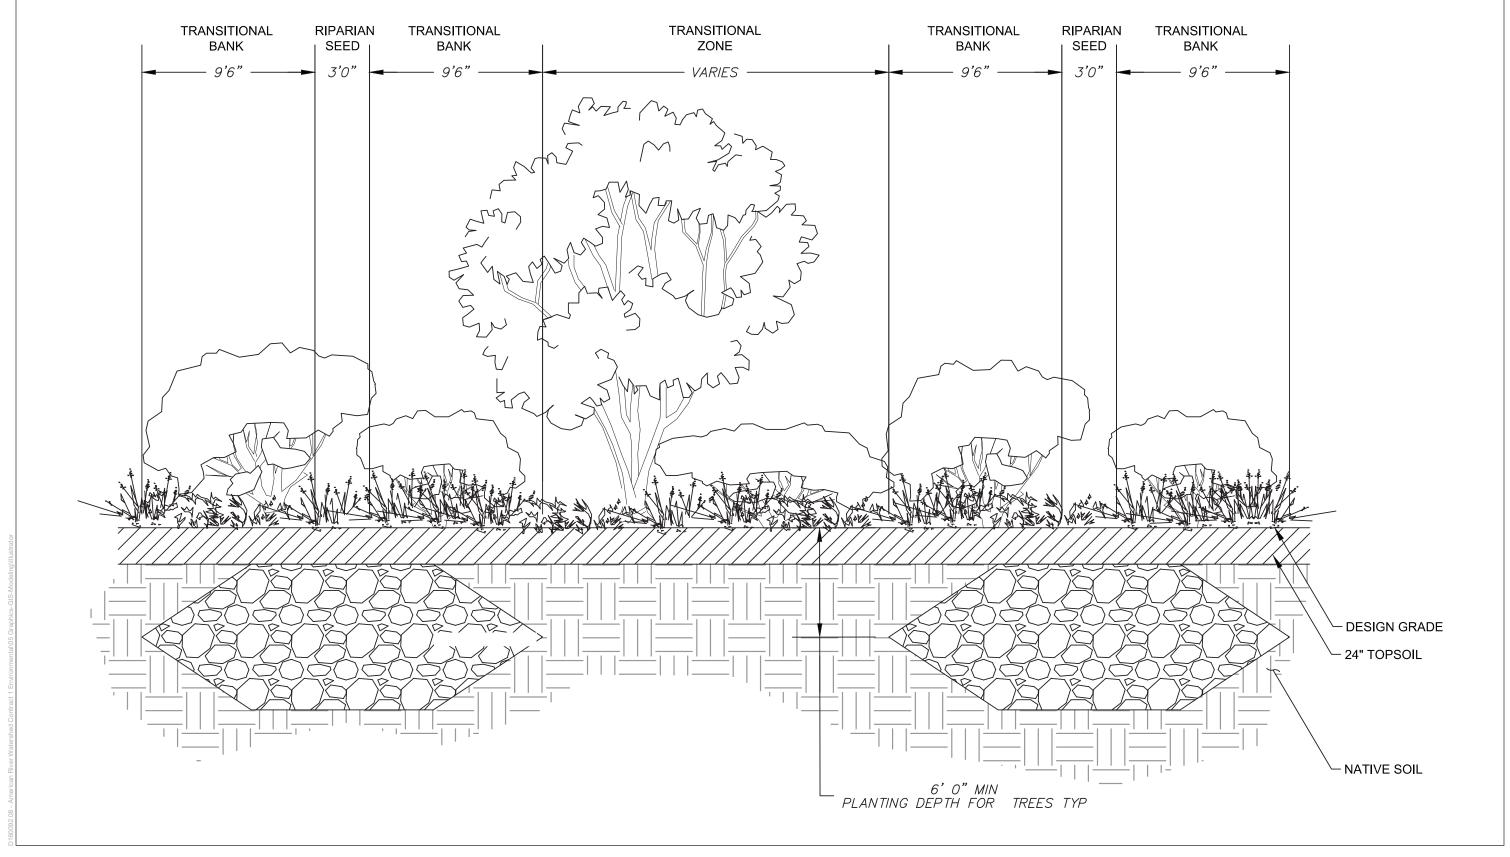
Typical Cross Section of Planting Plan between Rock Tie-Backs Section at Site 2-3
